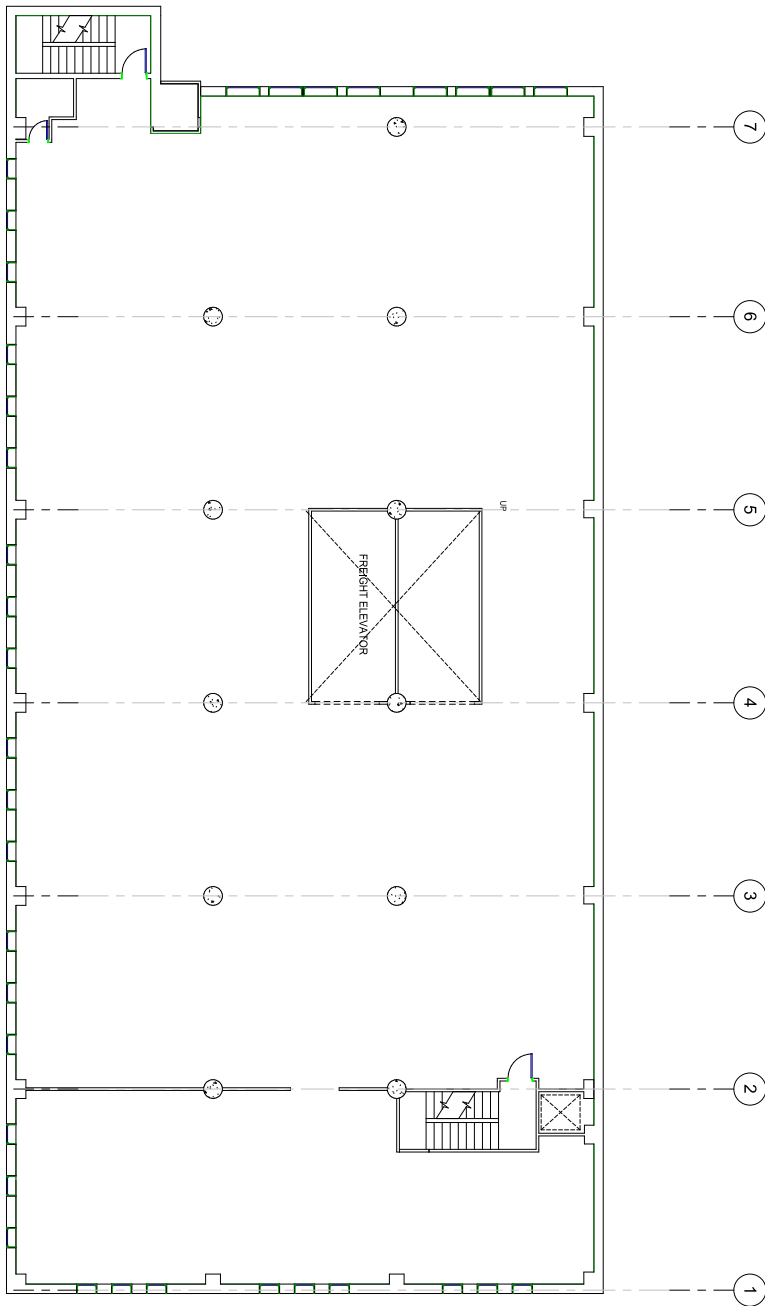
As-Built Third Floor Plan. (WILDESIGN Architects, 2018)
